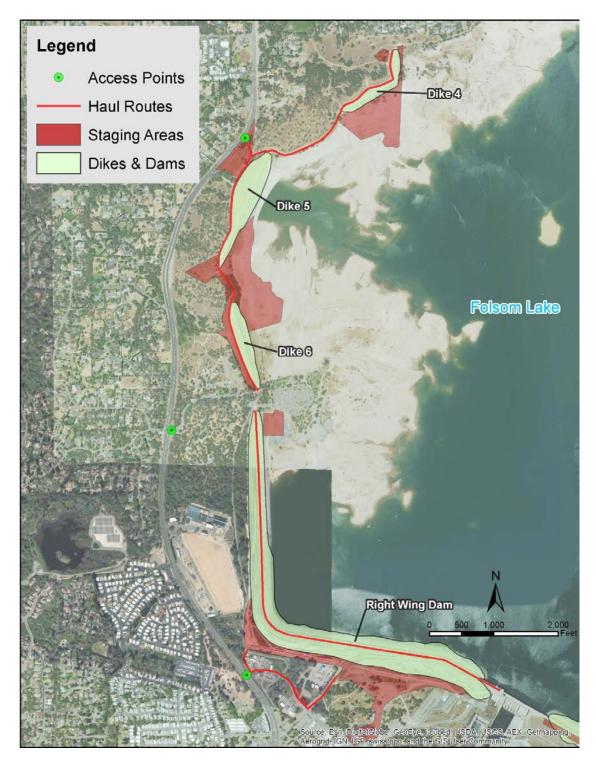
Haul routes, access points, and staging areas for the Right Wing Dam (RWD) floodwall construction work (one of the concrete floodwall elements) and for the raising of Dikes 4, 5, and 6 (one of the earthen raise elements).
